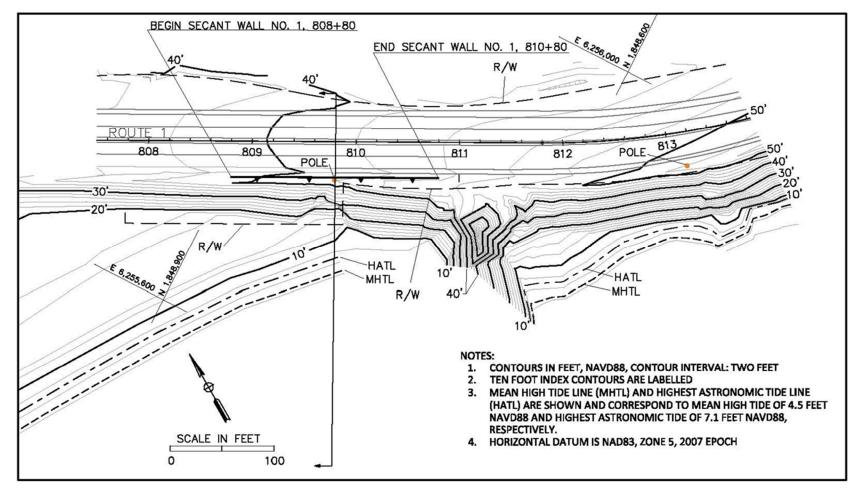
Plan view of the proposed secant wall and surrounding topography at PM 4.2.
